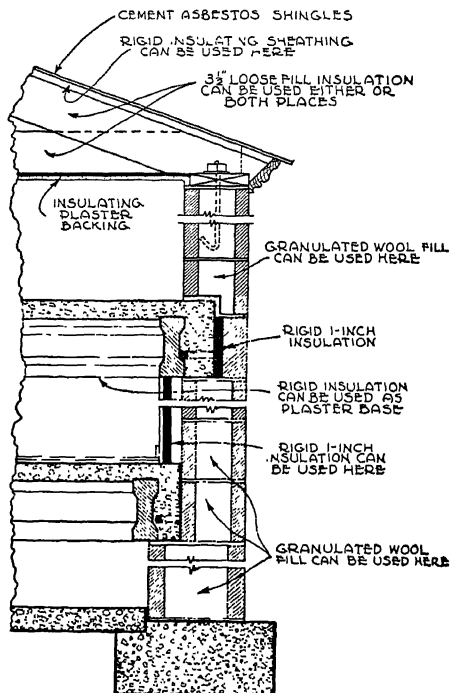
Section of Stucco and Frame Wall Showing Application of Various Insulations
